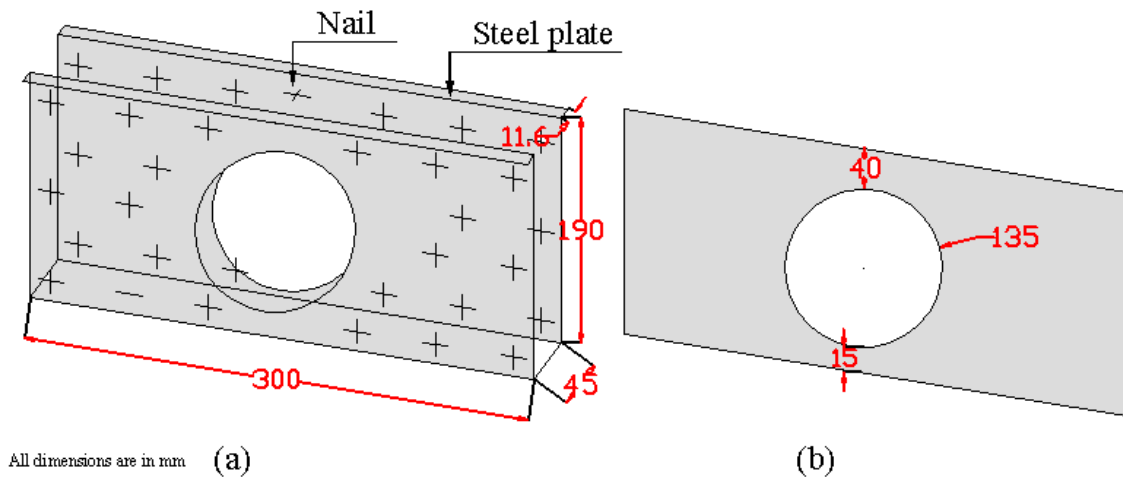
Steel bracket dimensions for beam of 190 mm depth: (a) 3D configuration, (b) dimensions of the hole
